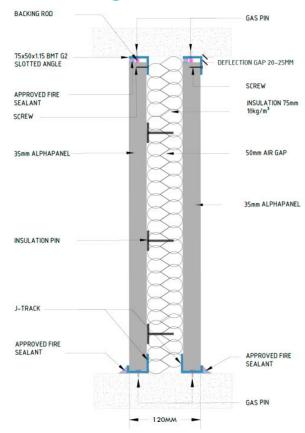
AlphaPanel wall for -/120/120 applications – minimum 35 mm thick AlphaPanel on each side of the wall (minimum wall thickness 120 mm)
